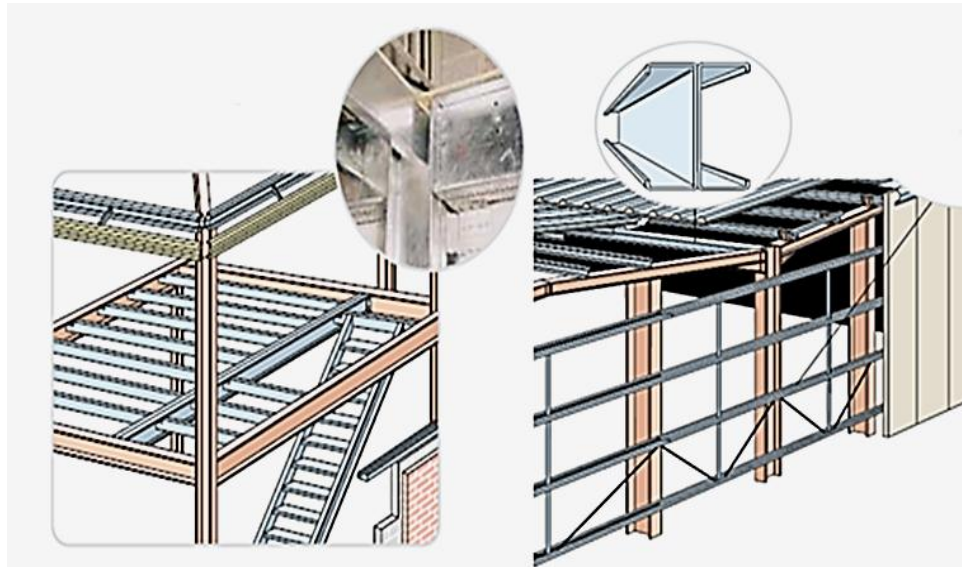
Use of CFS purlin system in floor construction and roof construction respectively (Kingspan multibeam 2007, 5)
